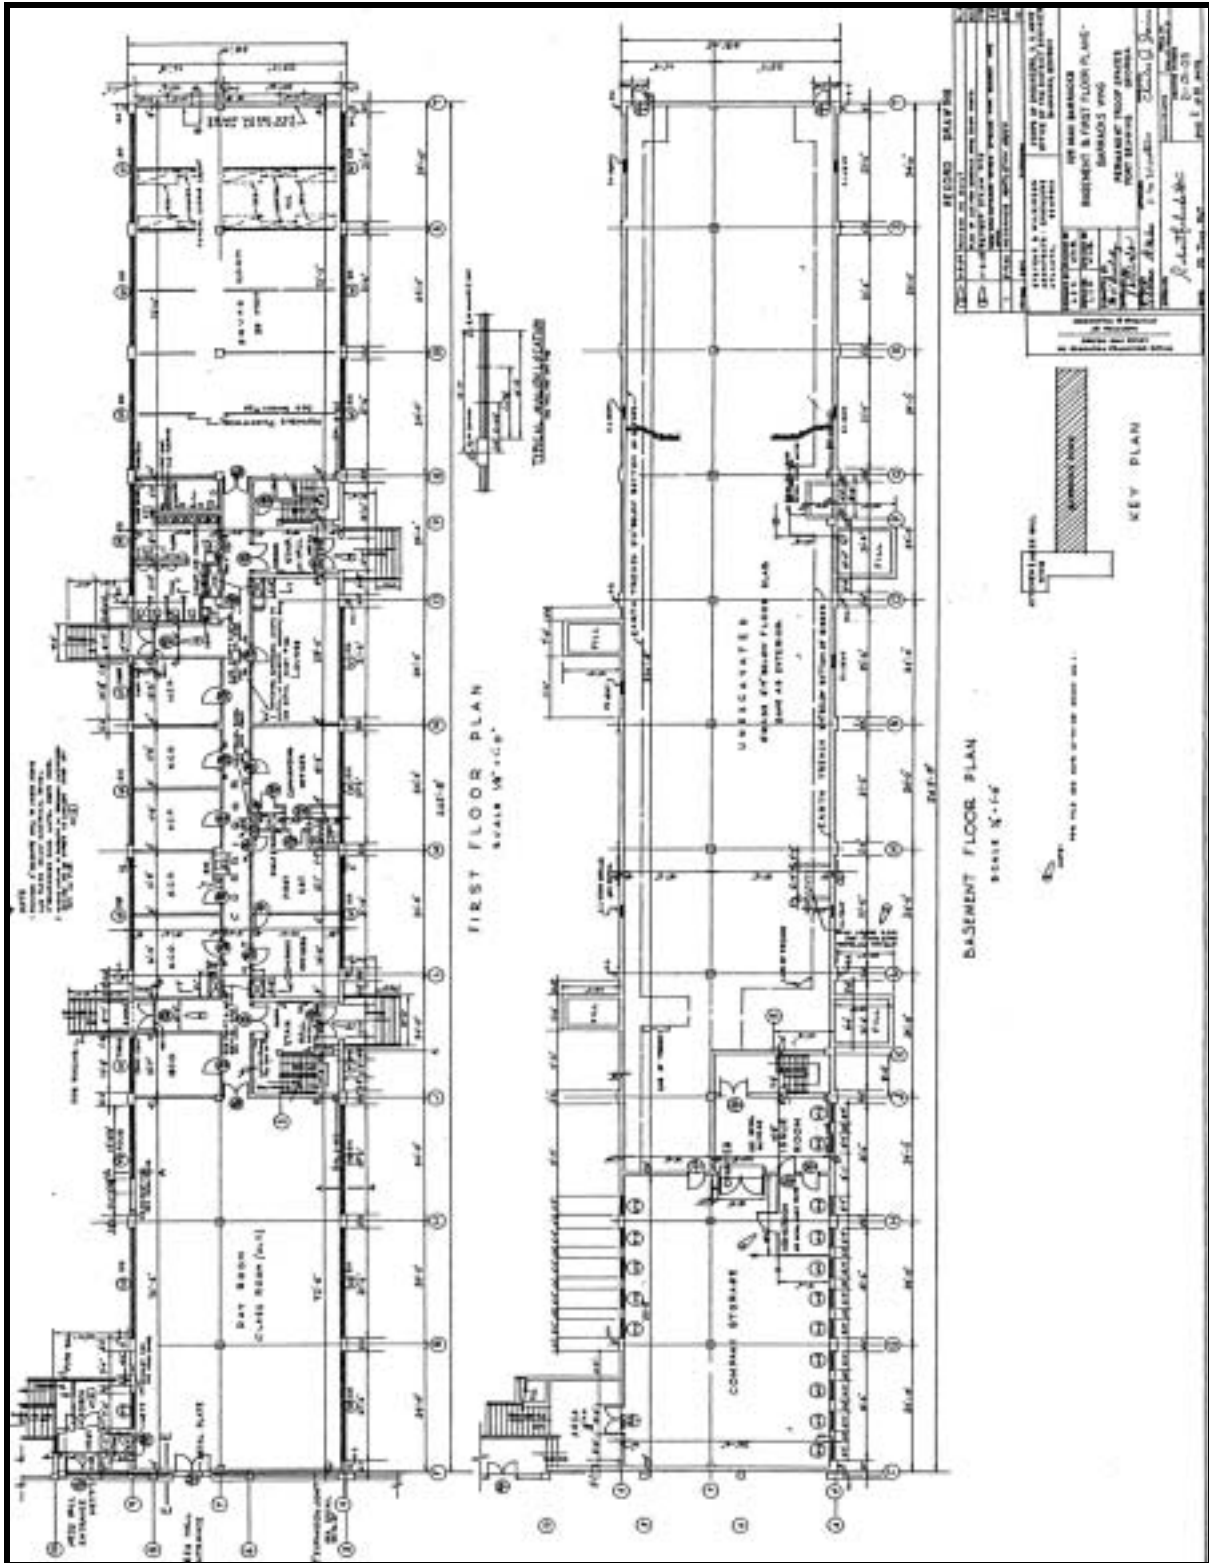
225-man hammerhead barracks, floor plan, barracks wing, basement and 1st floor (ca. 1951, revised 1967) (Engineering, Ft. Benning).
